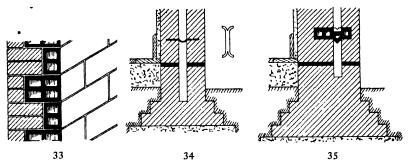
Terra-cotta hollow-block facings. Fig. 34. Cavity wall with galvanized-iron ties. Fig. 35. Cavity wall with glazed stoneware ties.
